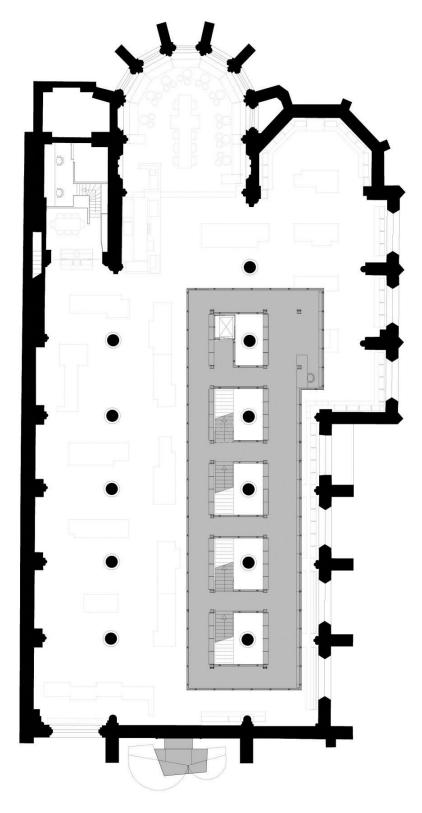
Inserted bookcase design highlighted in context of floor plan. Not to scale.
